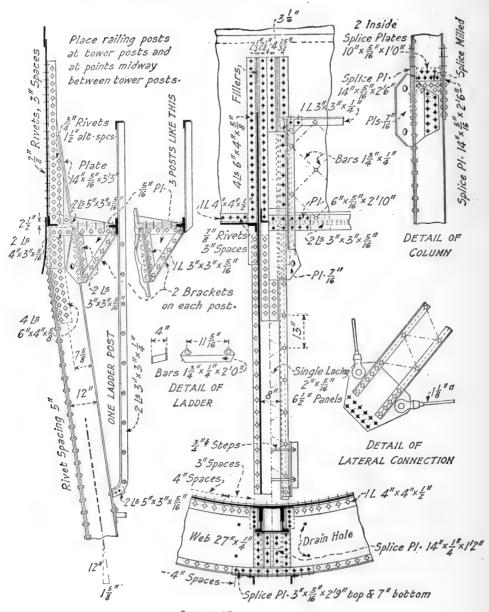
ELEVATED TANK AND TOWER, JACKSON, MINN.
